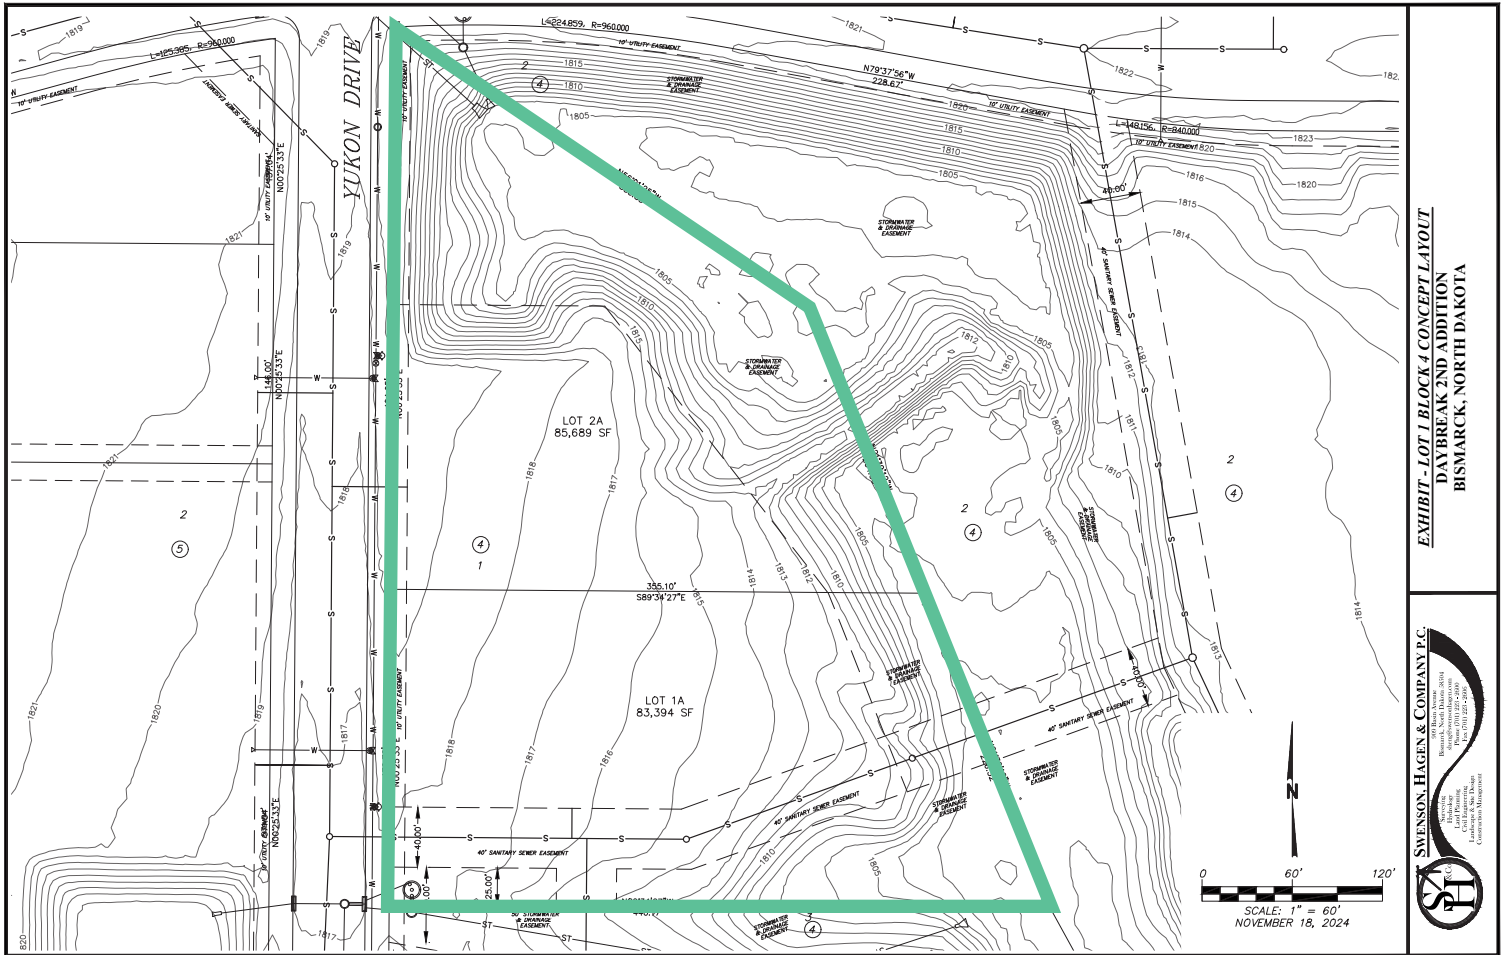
BLOCK 4 CONCEPT LAYOUT
